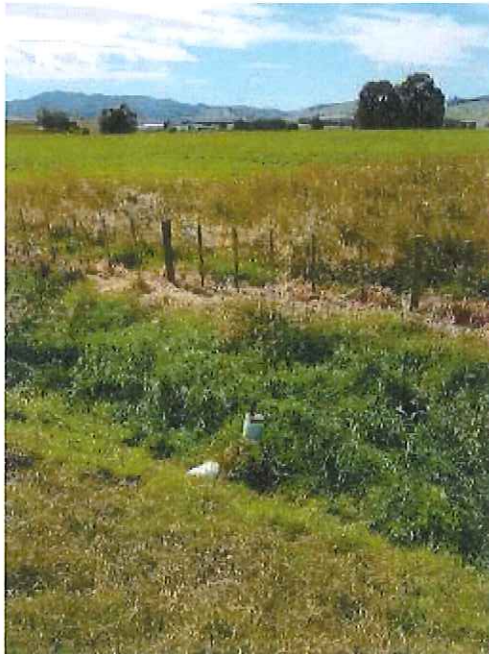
Photo of drain on property boundary, and winter stormwater bypass.
